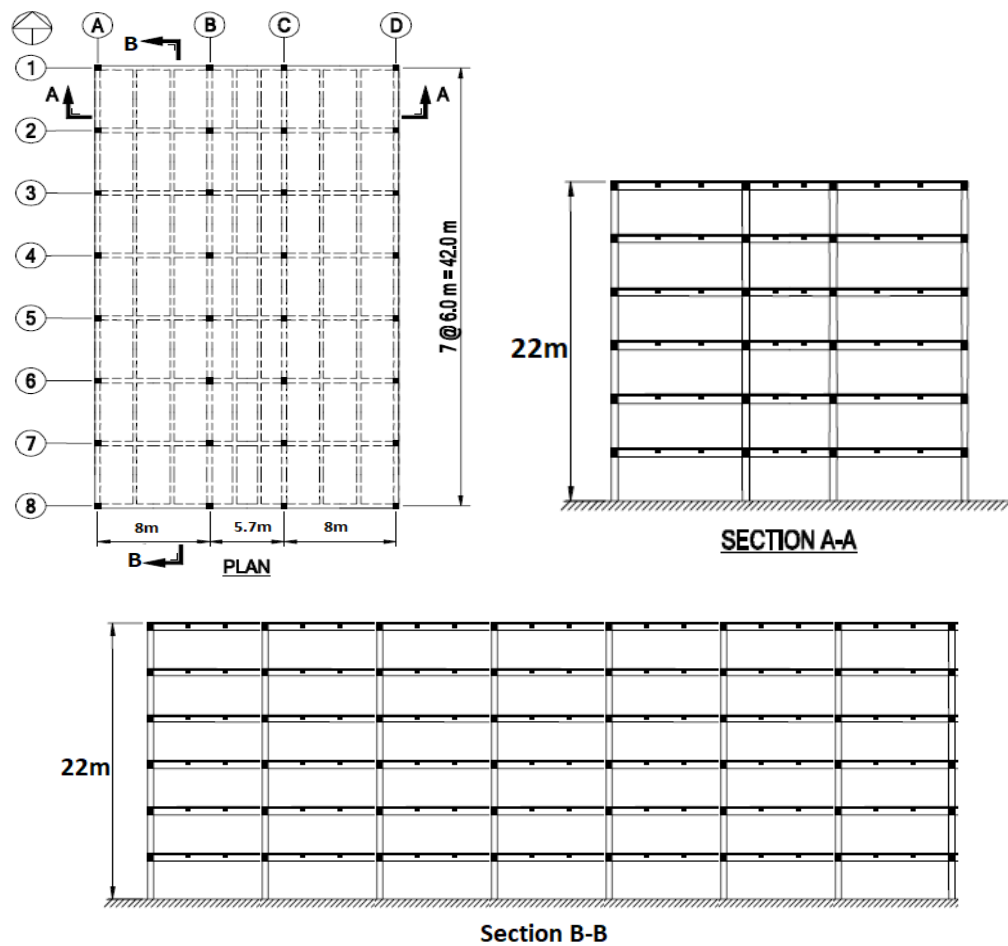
Proposed prototype building plan and elevation views, located in Vancouver
